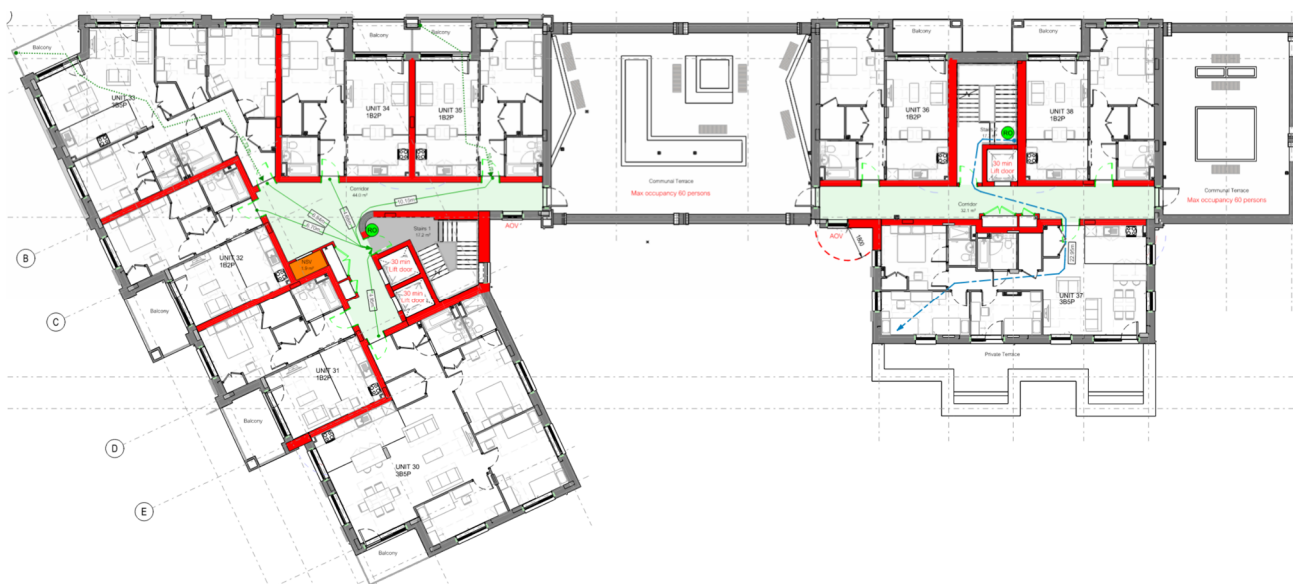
Third floor layout (Dwg No: M9534-HUN-02-03-DR-A-05-4003).
